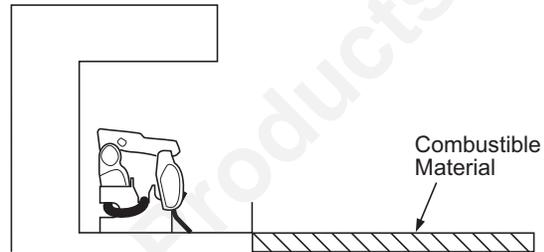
Minimum Fireplace Clearances If Installed at Floor Level
